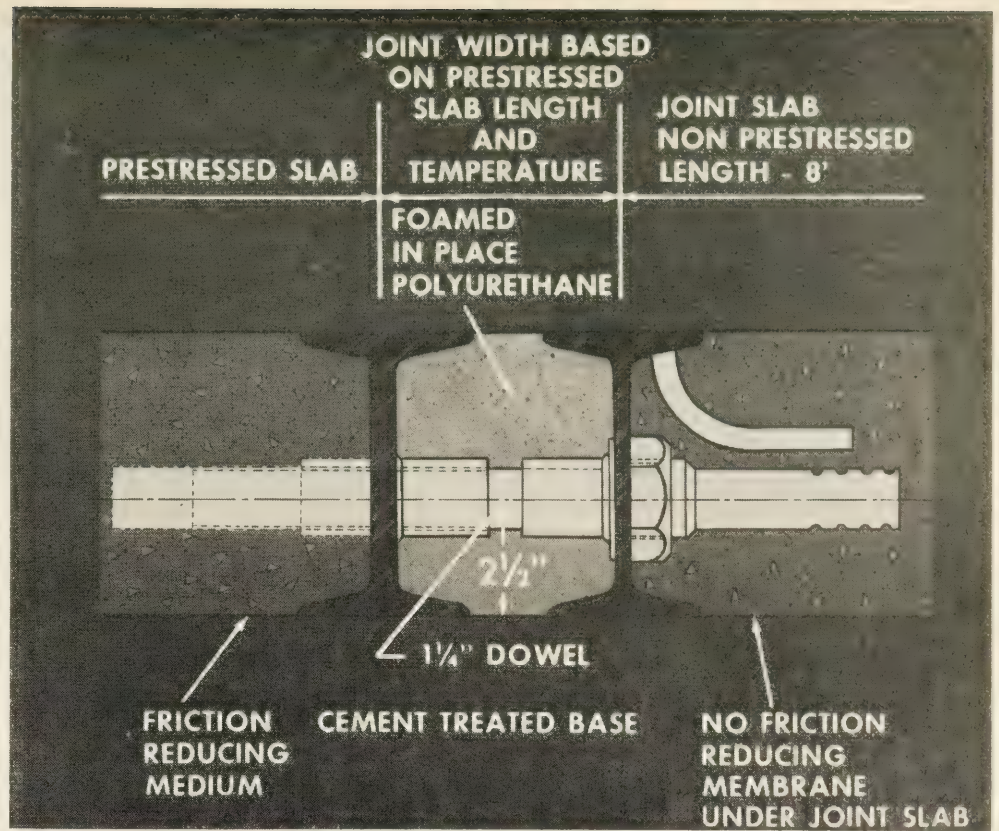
Detail of joint longitudinal section showing joint beam fastened to dowel units.
